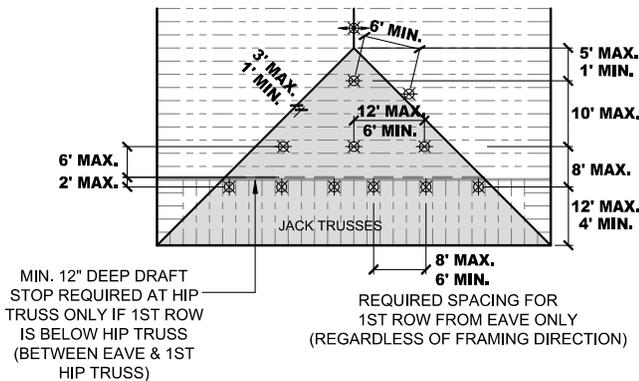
A: HIP LAYOUT CRITERIA WHEN FIRST ROW OF SPRINKLERS PLACED "WITHIN" JACK TRUSSES
